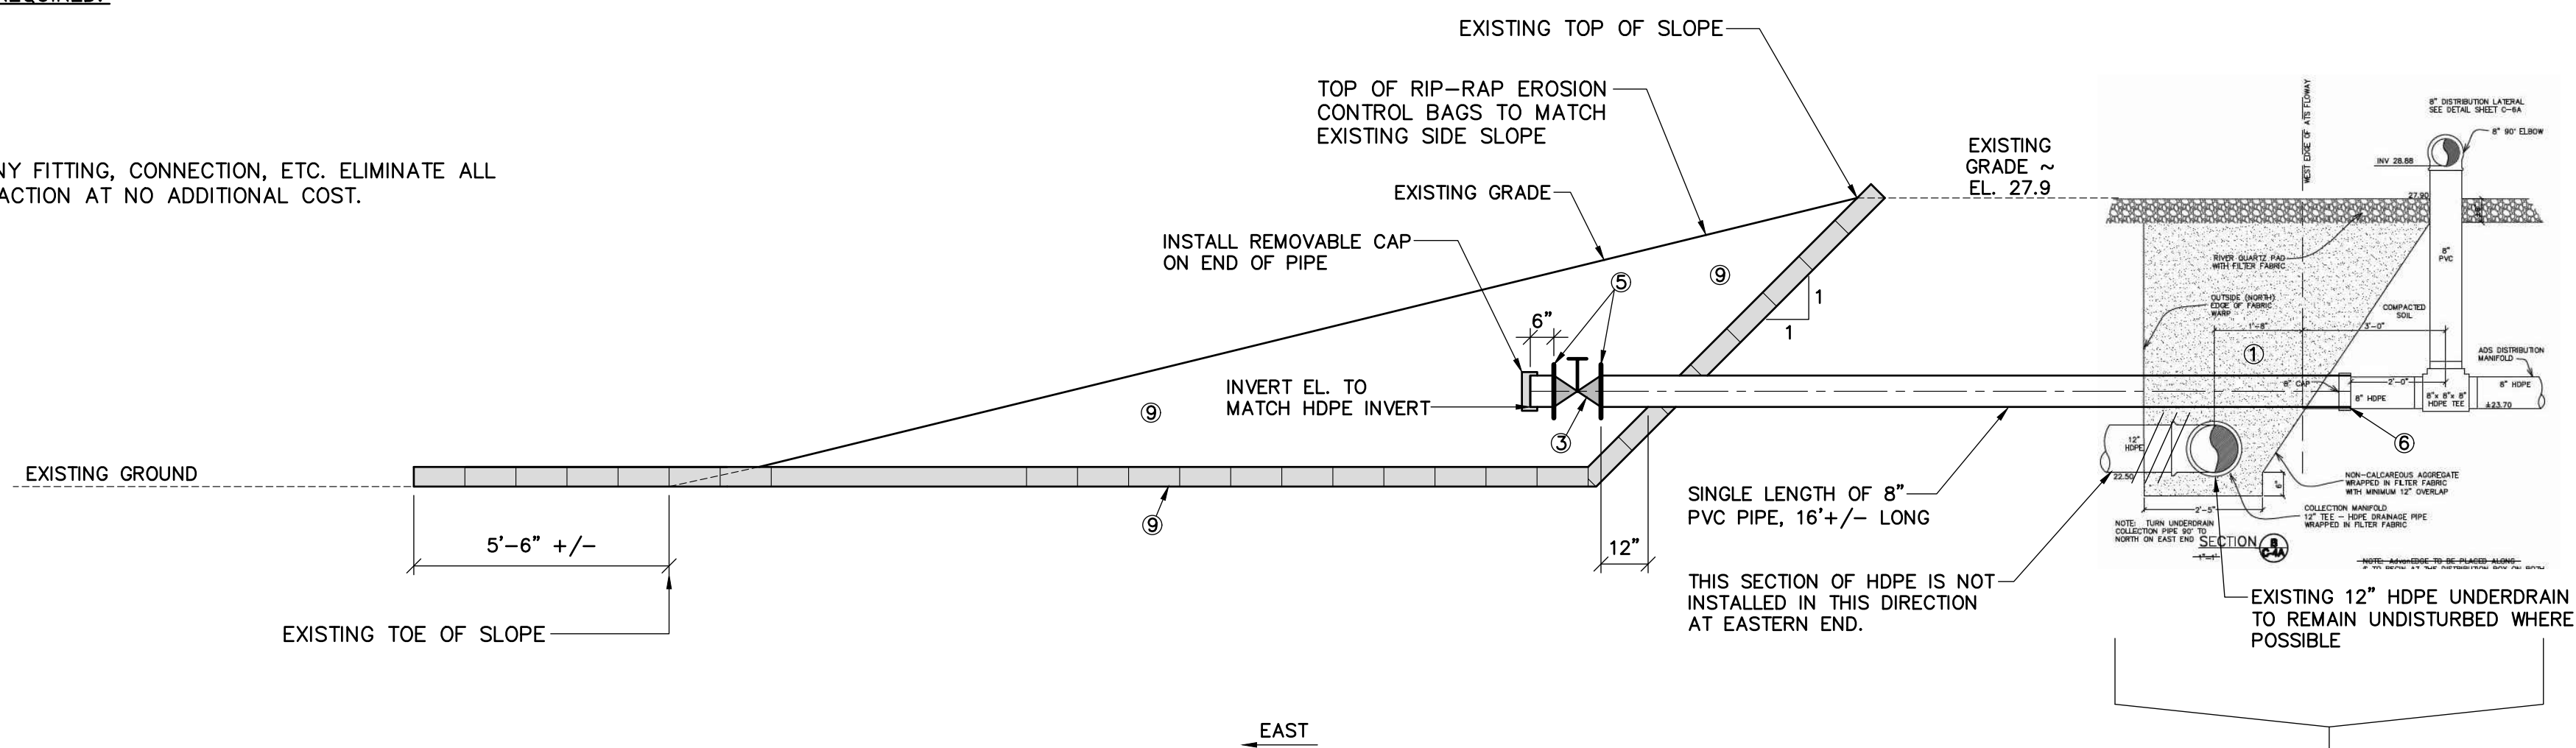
DETAIL: TYPICAL NEW LATERAL VALVE INSTALLATION
